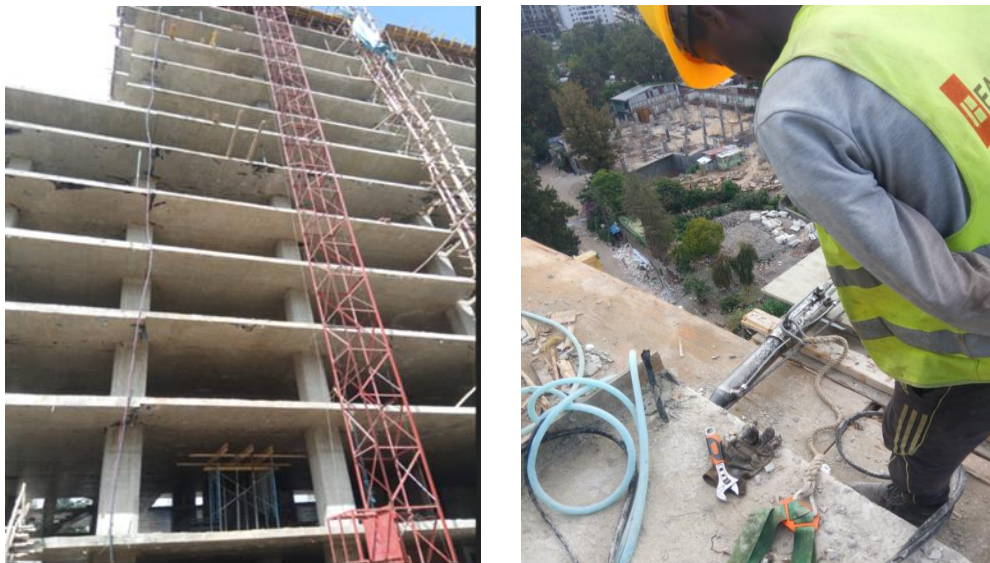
Post-tensioned flat slab building and Tensioning process at Kasanchis around Uraile Church
